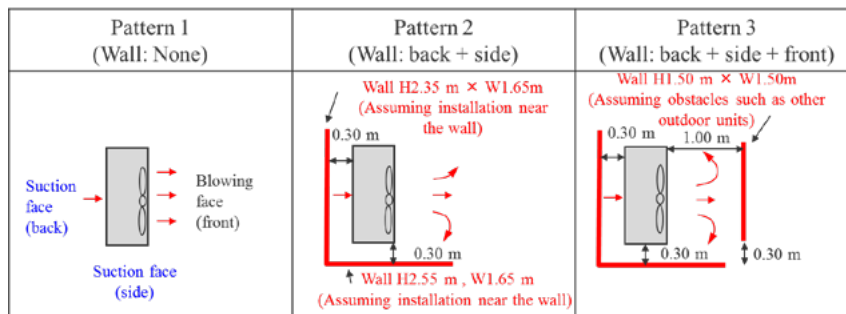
Wall installation patterns around the outdoor unit of the air conditioner
